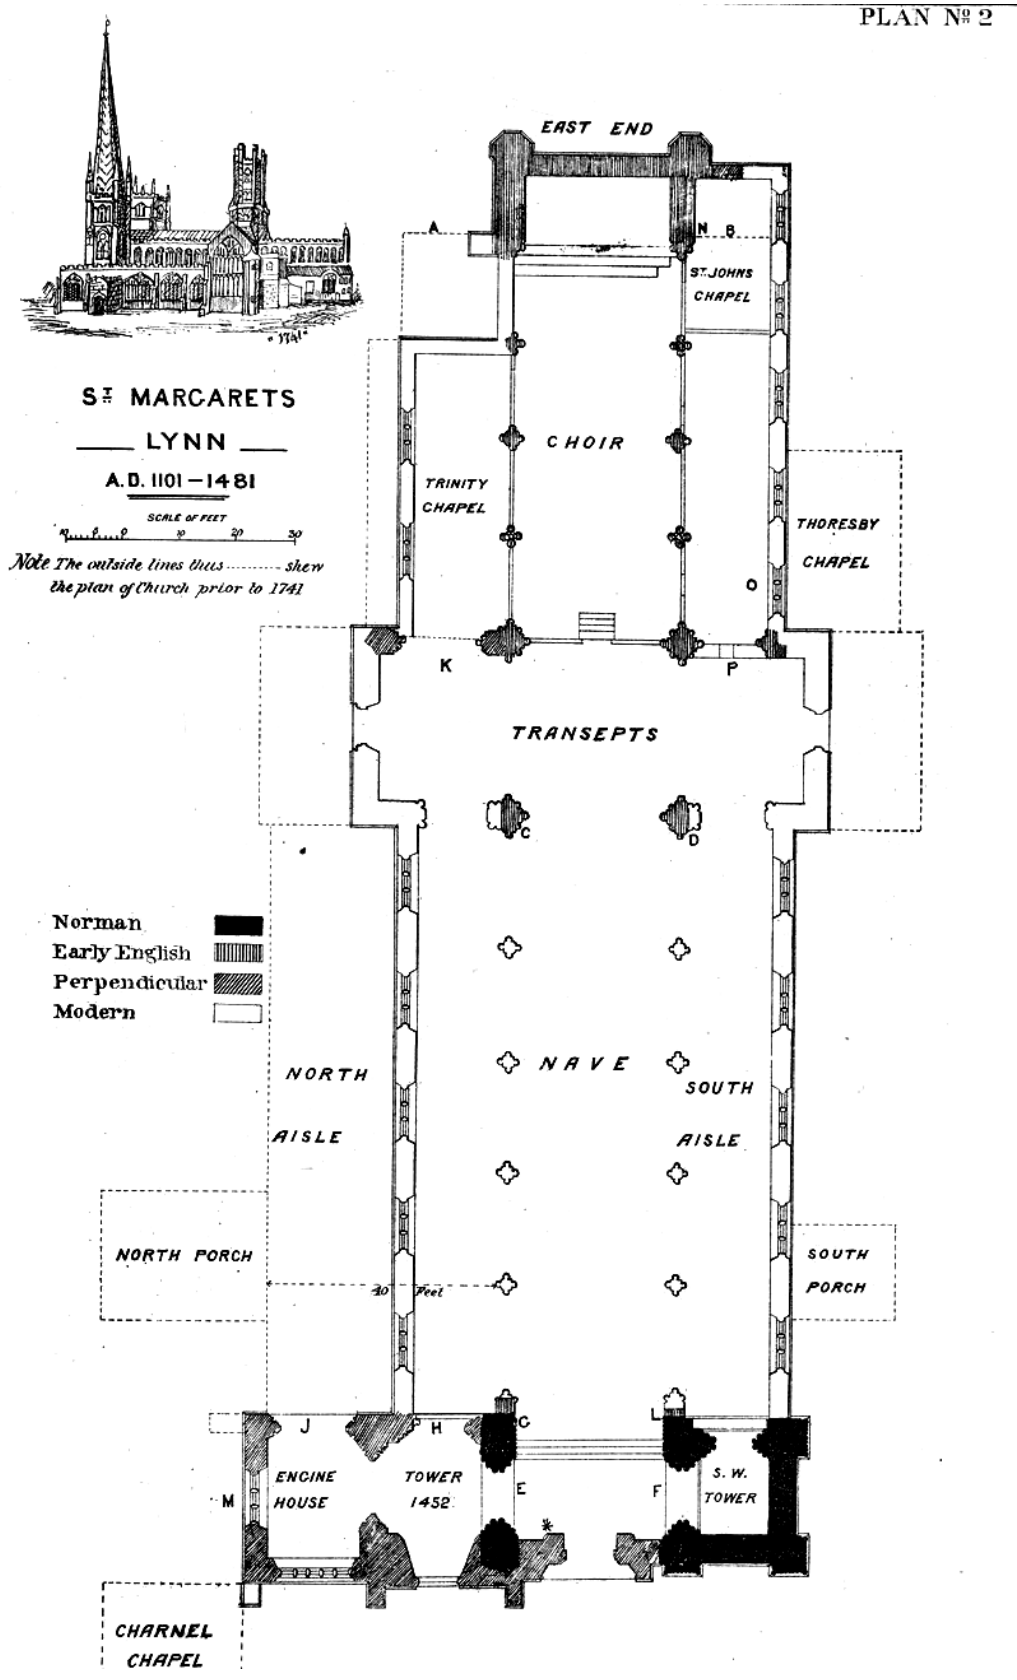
Floor plan in 1899 (Beloe 1899, Plan 2)
